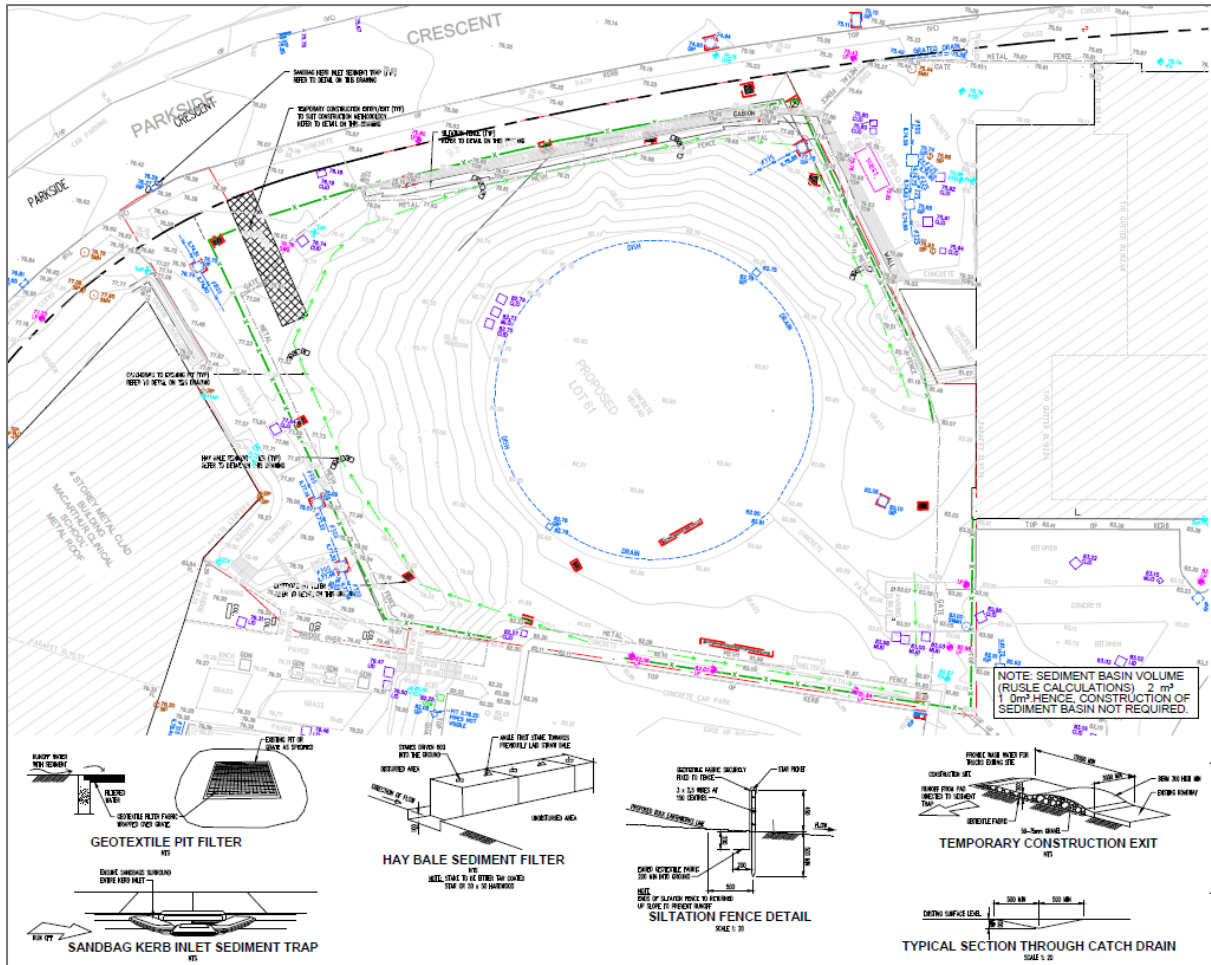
Proposed erosion and sediment control plan. Source: TTW.
